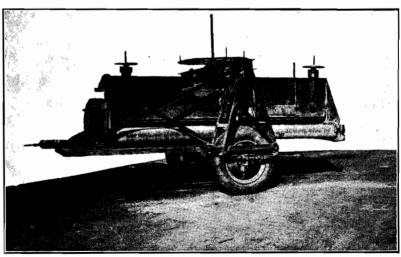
Rotating Belt Aggregate Spreader Mounted on Carrier.
